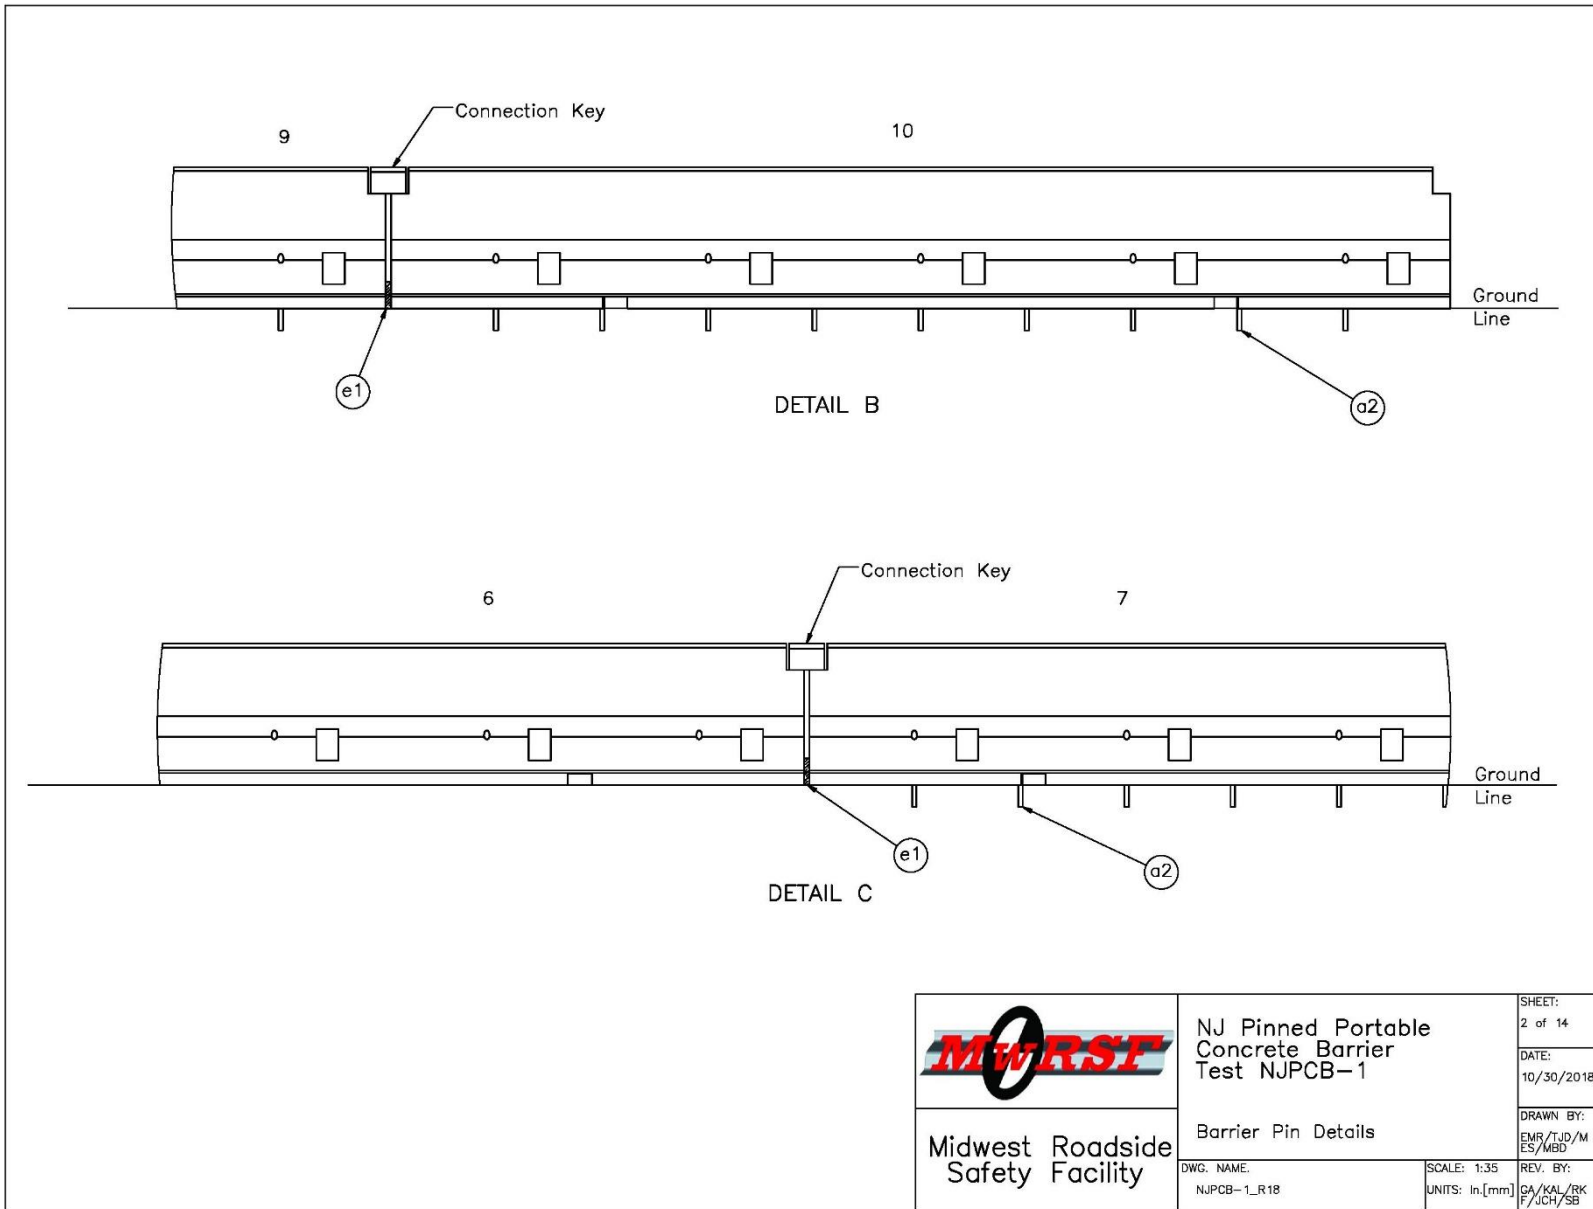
PCB Pin Anchor Details, Test No. NJPCB-1
